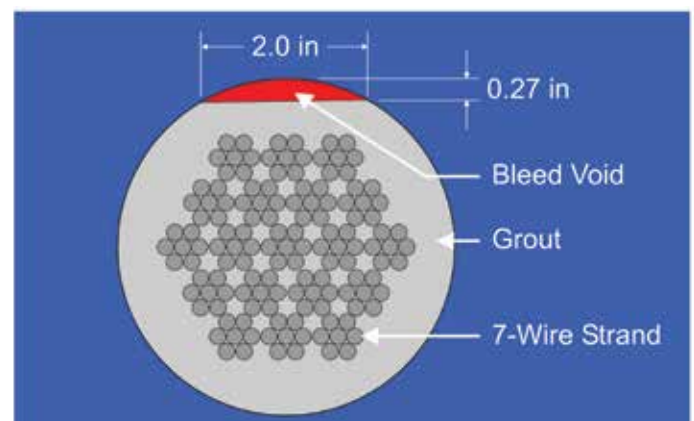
Typical Varina Enon horizontal tendon section with bleed void. (Note: 1 in. = 25.4 mm.)
